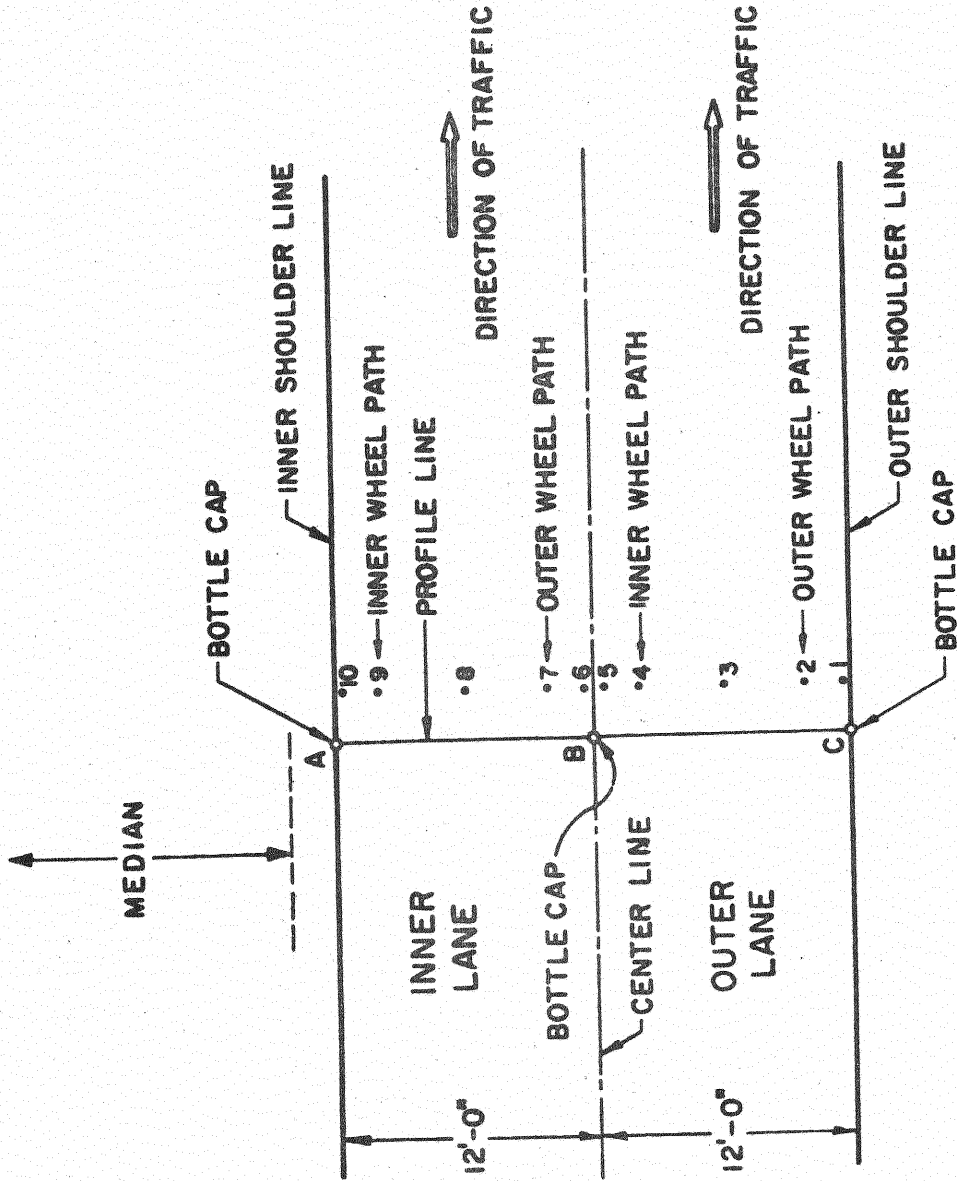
Layout of Transverse Test Point Locations at a Test Site
